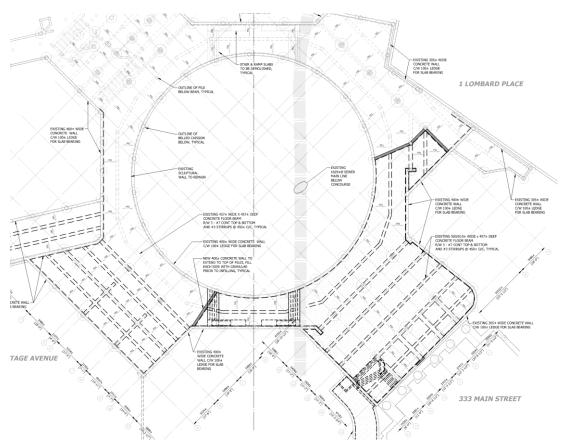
Extent of Demolition at Concourse Floor - Drawing S2.4
